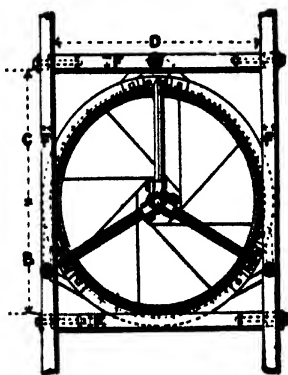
Front Elevation, showing the Seating Timbers required for Fixing a Fan of the Blackman Type.
